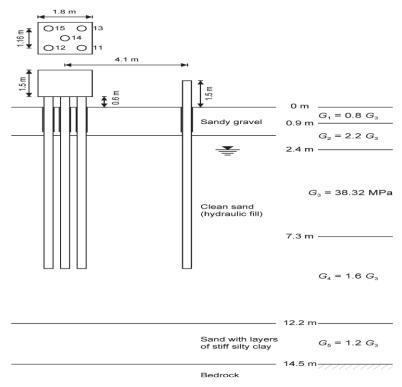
Layout of the pile group and soil profile- briaud et al. (1989)
